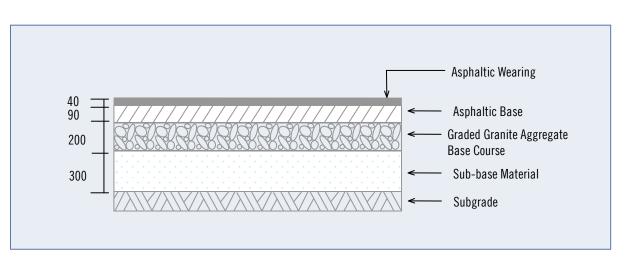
Flexible Pavement (Type II) For Primary Access Roads
